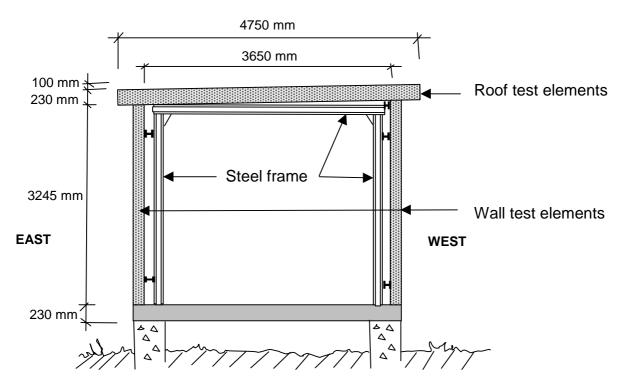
East-west section of the test house showing how the elements are fixed to the steel frame structure.
